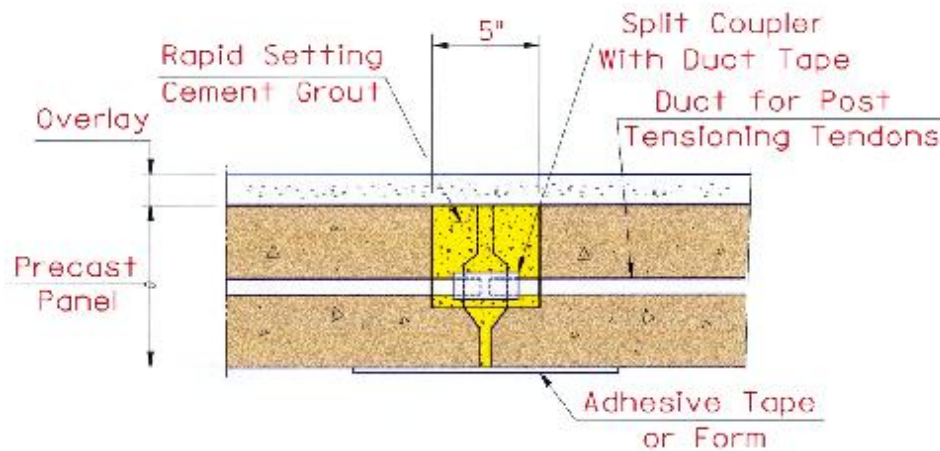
Post-Tensioning duct splice blockout
